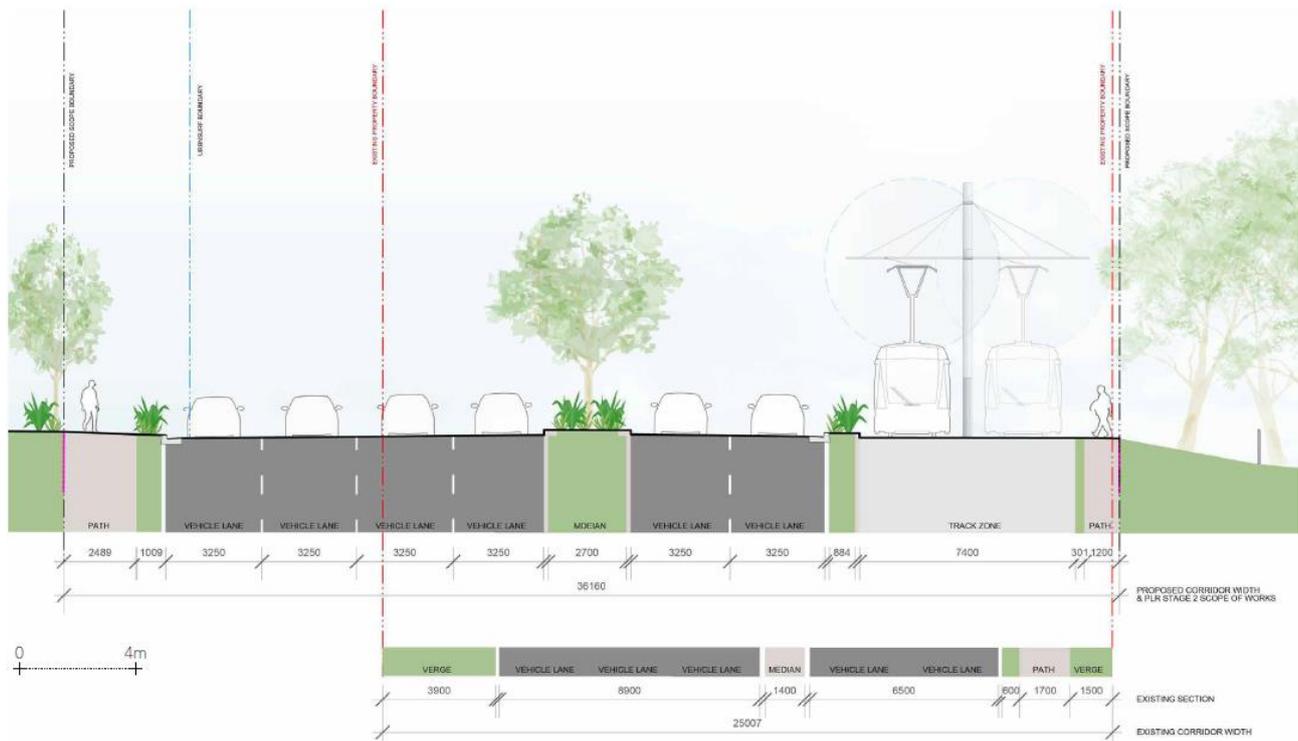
Cross section of Hill Road near Holker Street in Wentworth Point showing existing and proposed allocation of space (Source: TfNSW / ASPECT Studios)
